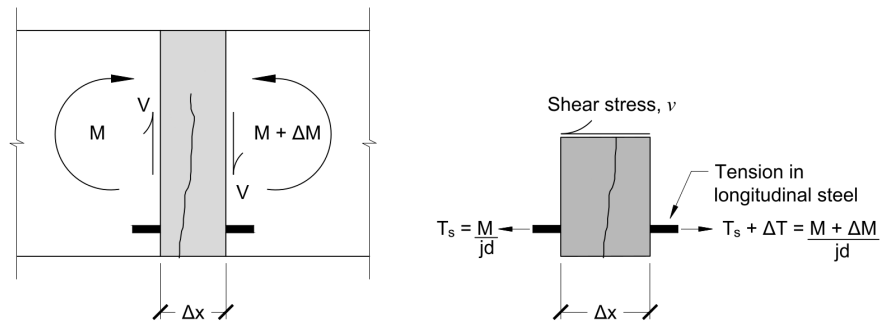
Derivation of the shear stresses in cracked reinforced concrete
